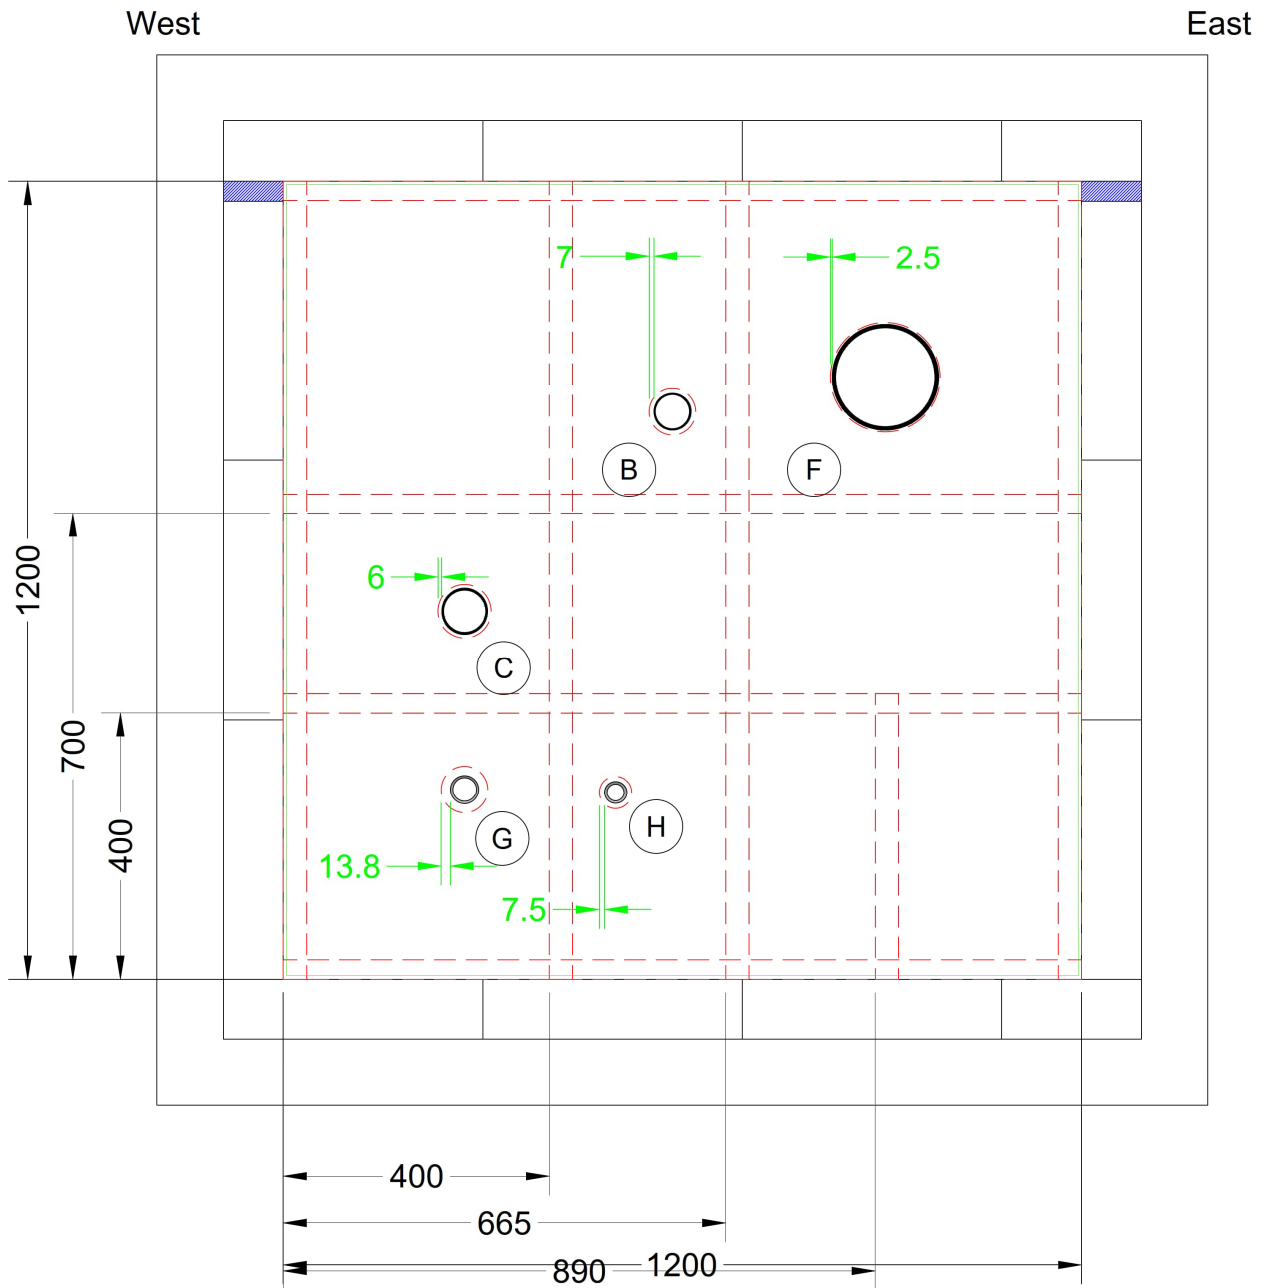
Elevation view of test specimen with aperture sizes, frame locations and annular gaps (unexposed side)
